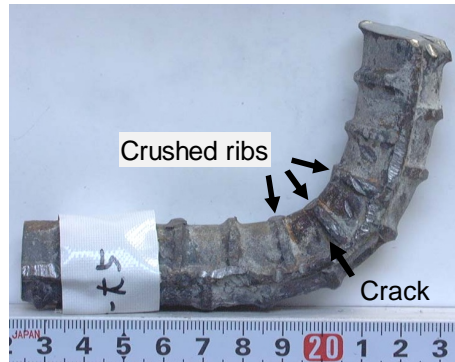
An Example of Appearance of Fractured Reinforcing Steel
